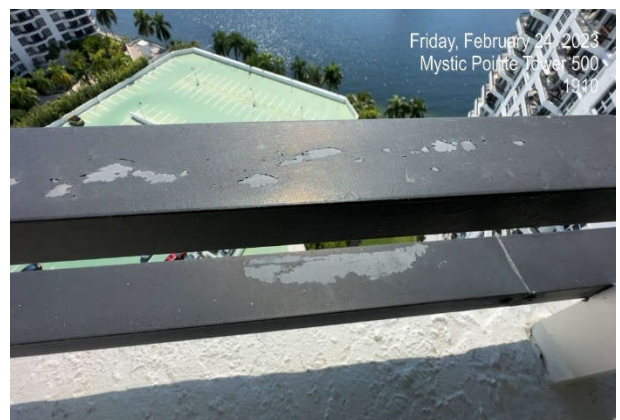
Peeling paint at the balcony railing (Unit 1910)
